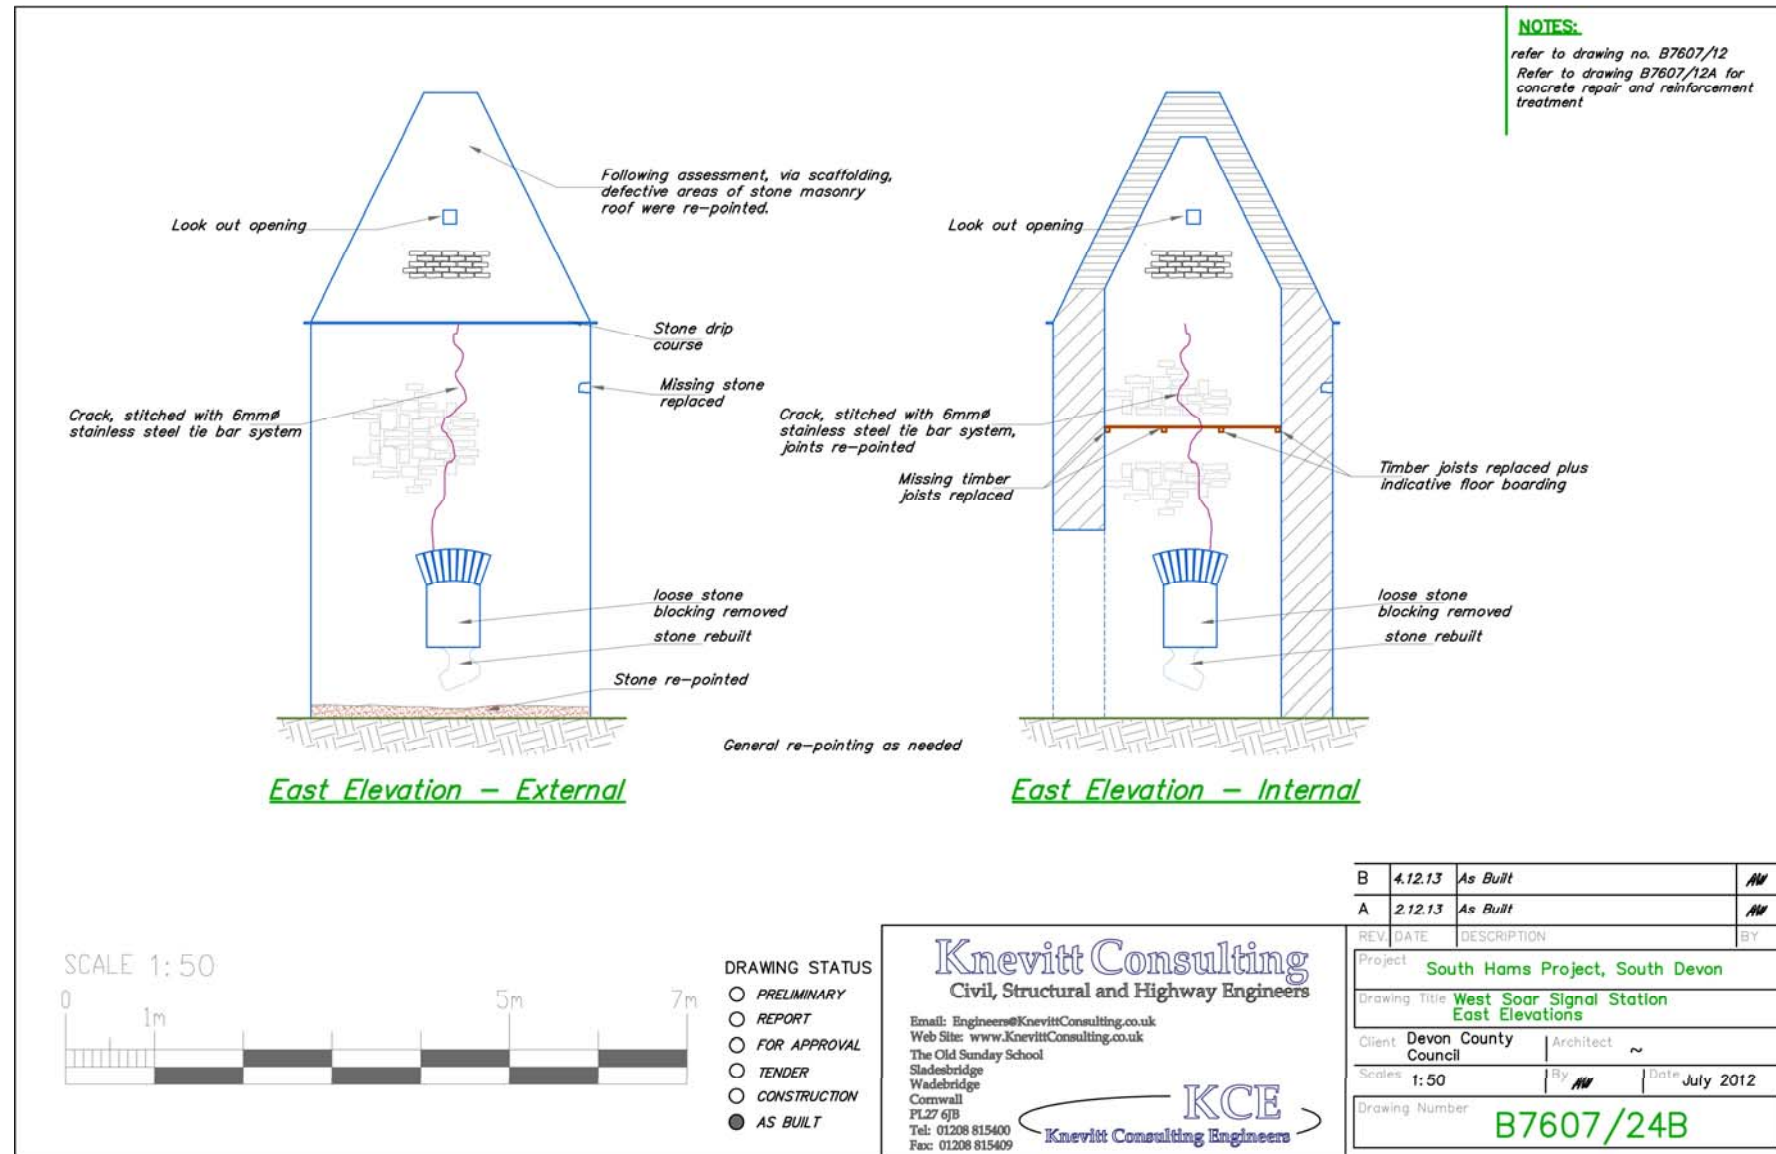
East elevations of the West Soar Signal Station after works © Kneivitts 4/12/13.
